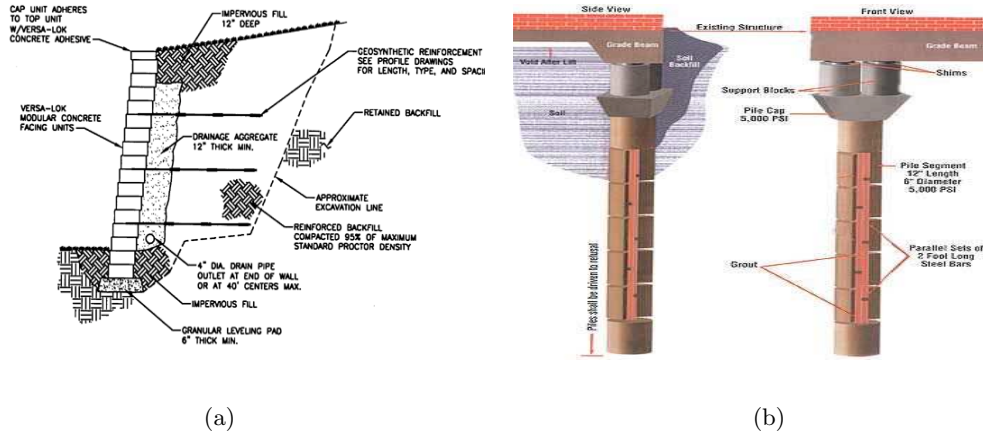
Application of soil-structure friction; (a) earth retaining structures with geosynthetic reinforcement; (b) pile foundations
